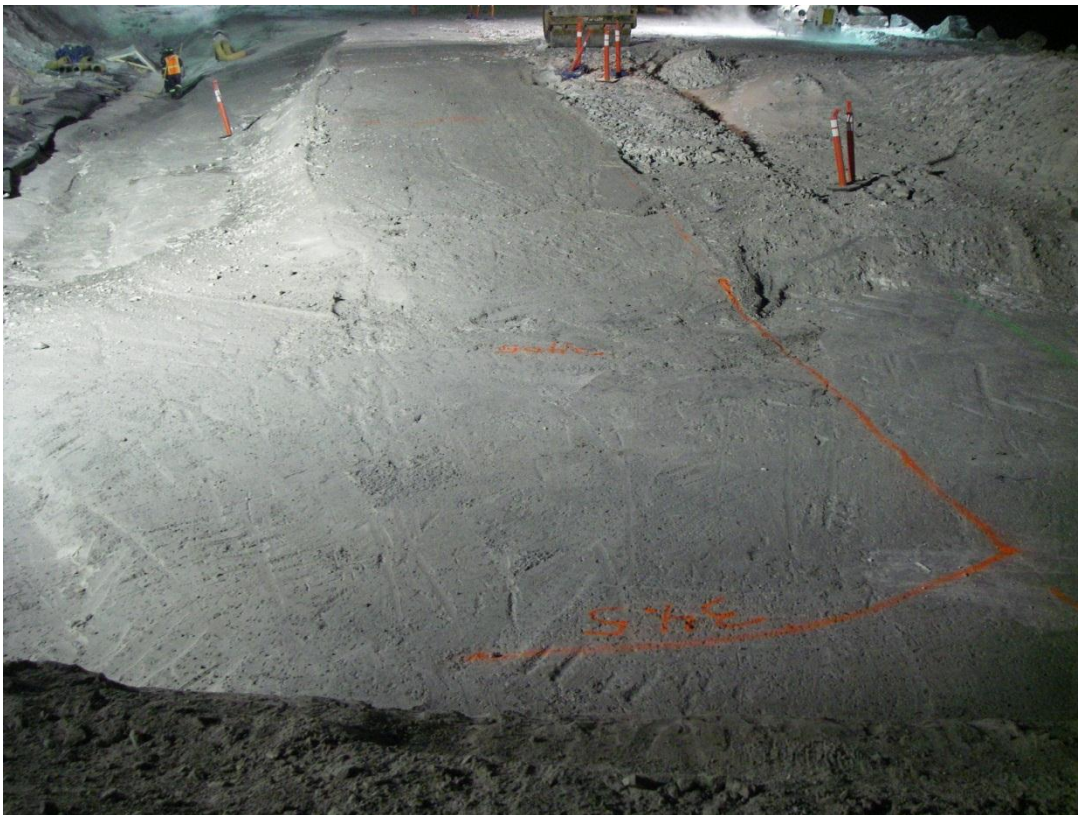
Photo of the north-east end of the frozen core. The surveyor marked up the current elevation of the core (34.5 m).
